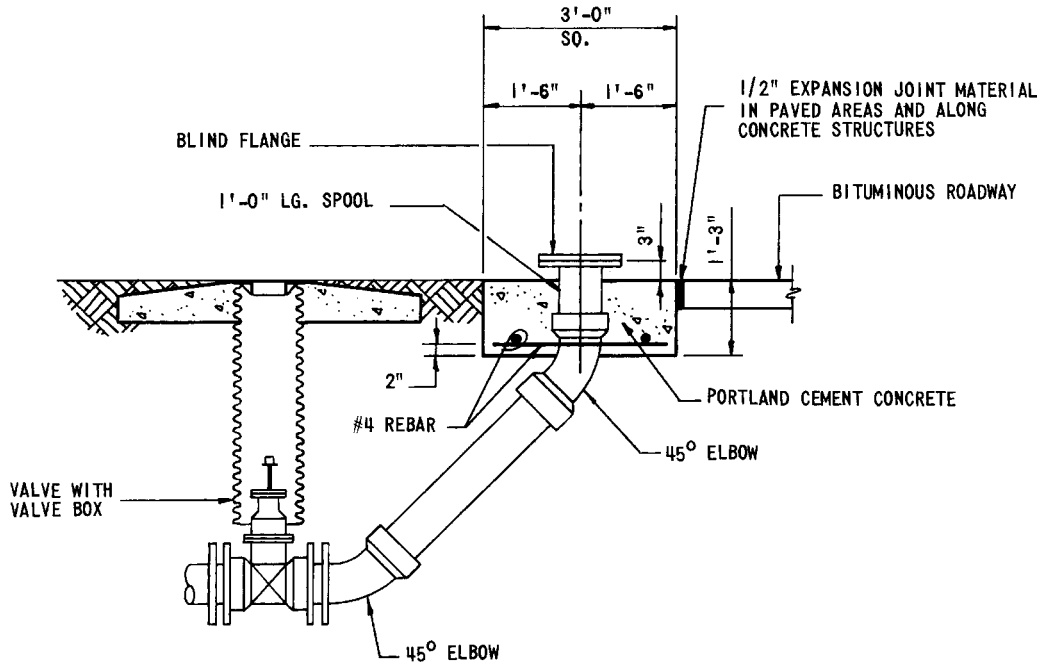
Underground pipe cleanout. Courtesy of Wilson & Company, Engineers & Architects.
